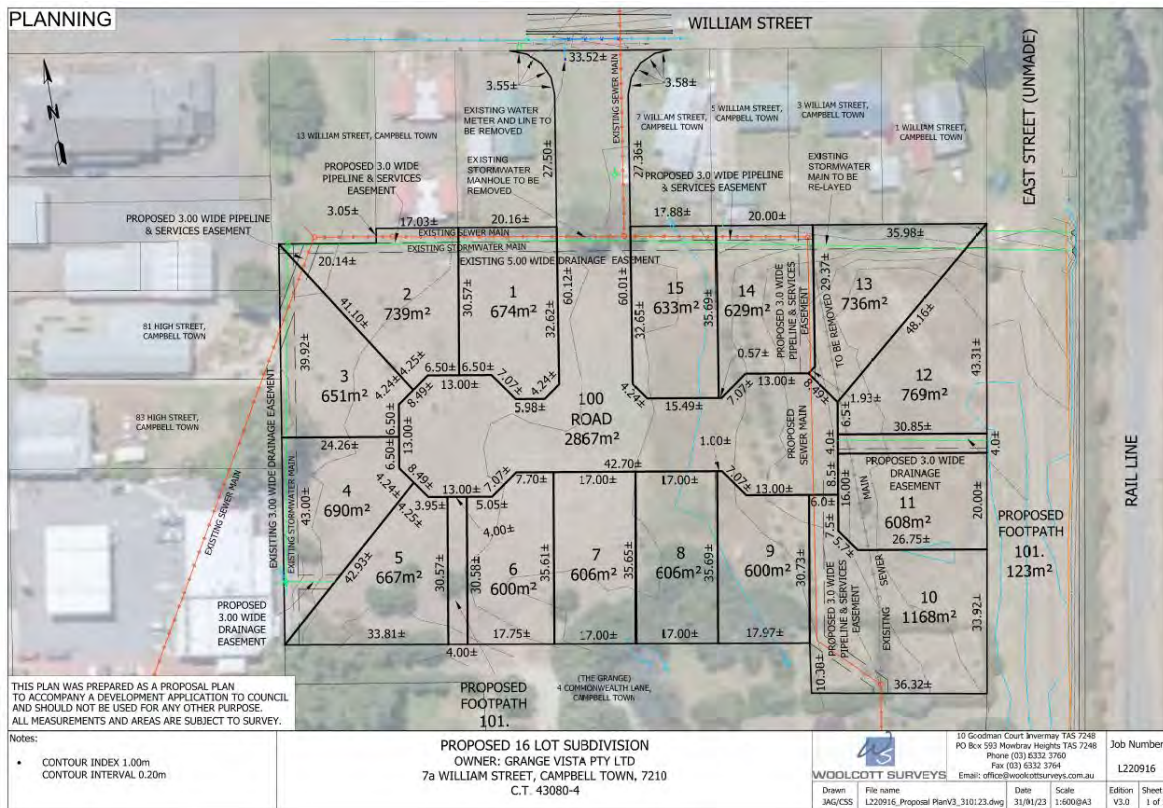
Proposed residential subdivision (ref. Woolcott Surveys L220916 Proposal Plan 310123 V3)
